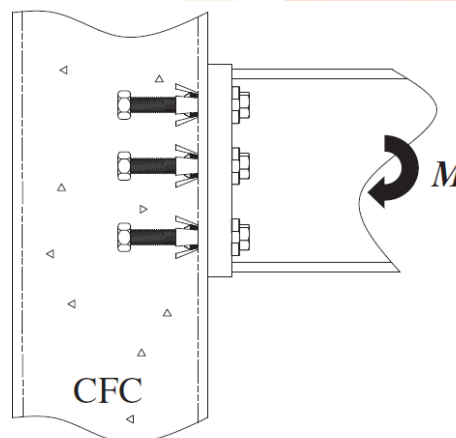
Hollo-Bolt Moment Connection Between I-Beam to Concrete Filled Column – (Tizani-2013)
